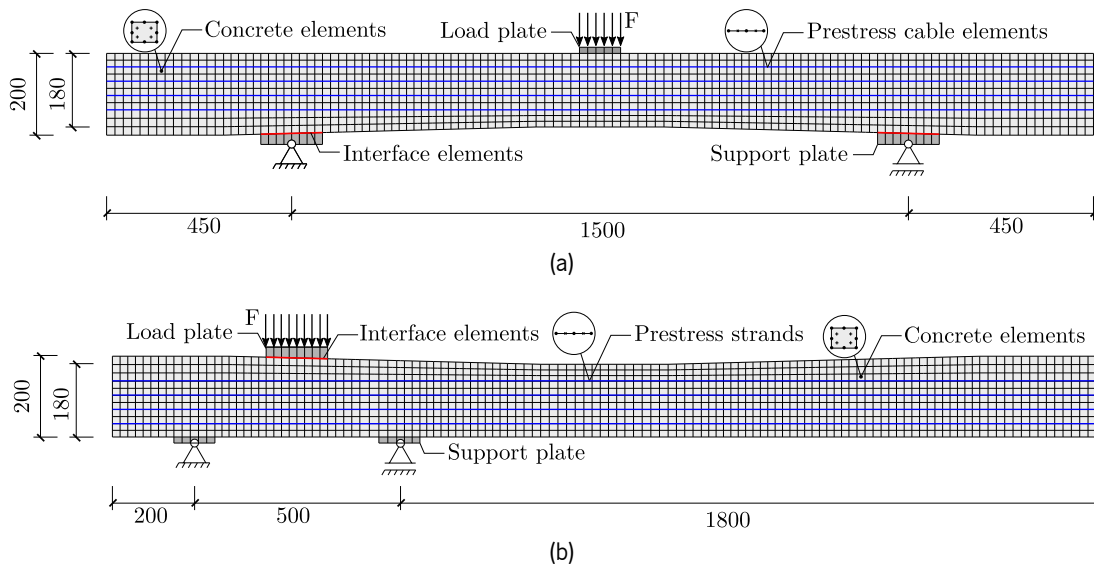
Geometry, loading, support conditions and FE mesh adopted in the simulation: (a) centre section and (b) rail-seat section (dimensions in mm)
